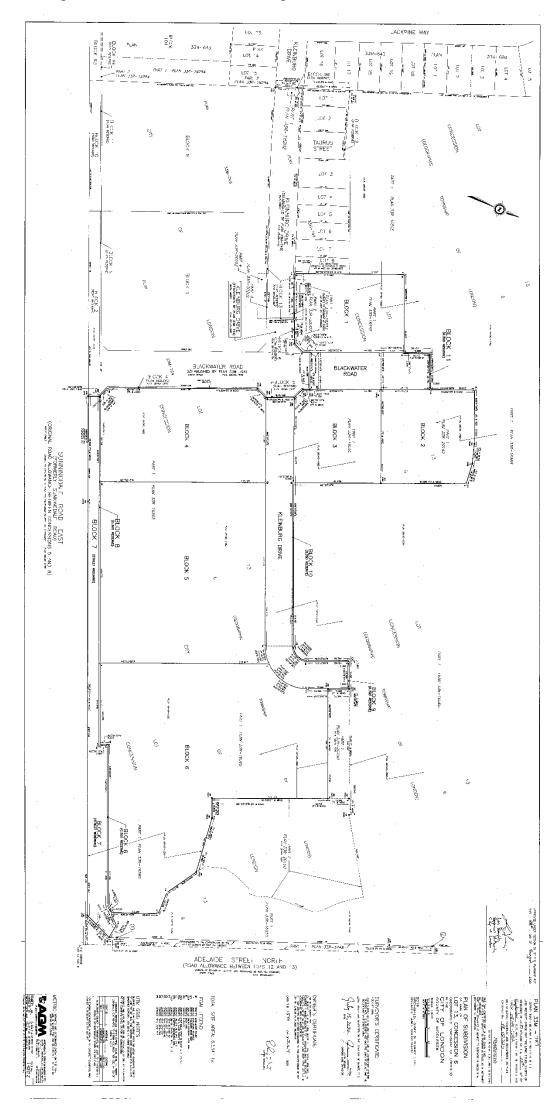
Registered Plan 33M-787, showing location of Blackwater Road.
